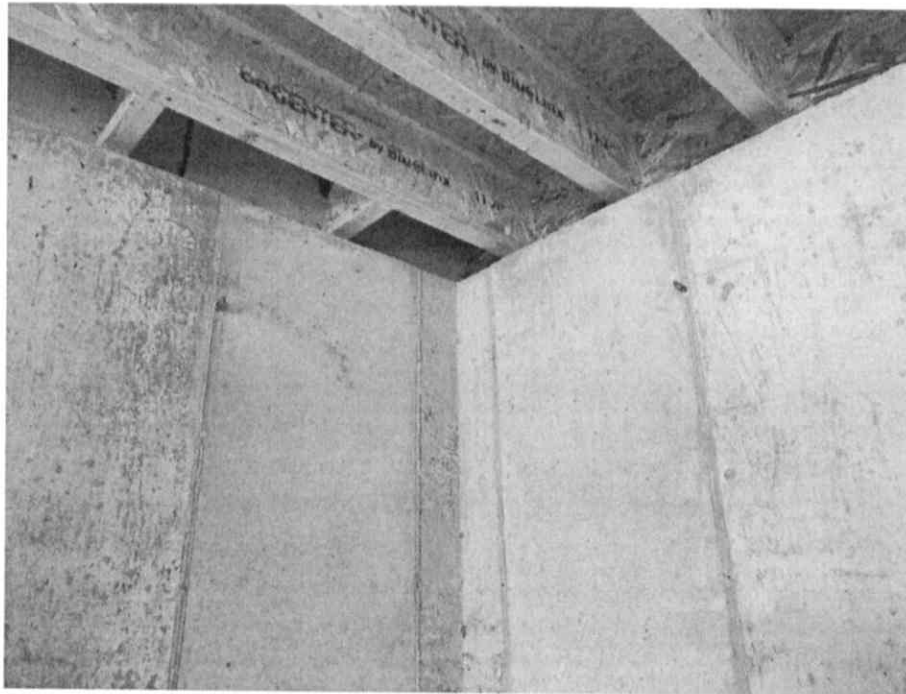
View of the top portion of the foundation wall at the northwest corner showing an absence of visible cracks.
